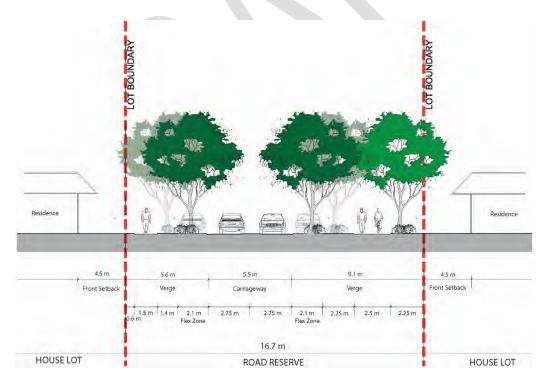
Green Link Road Cross Section (Flex Zone)
